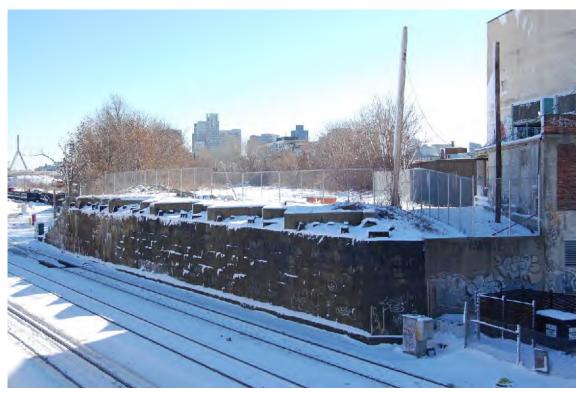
Circa 1883-1900 retaining wall behind 245 McGrath Highway in Somerville.
